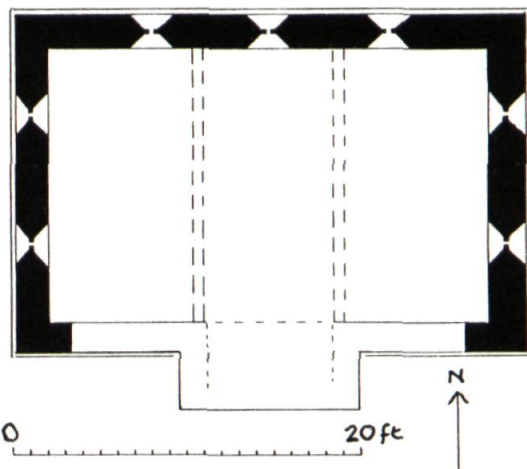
Plan of the c. 1600 falconry or kennels at Chawton House (after a survey by Adam Knight). The floor joists (felling date between 1573–1617) rest on transverse beams (felling date 1772–74) which are dotted on plan and which may have been renewed when the west front was taken out. This west front (unshaded on plan) has recently been restored to resemble the Mellichamp painting of c. 1740.
